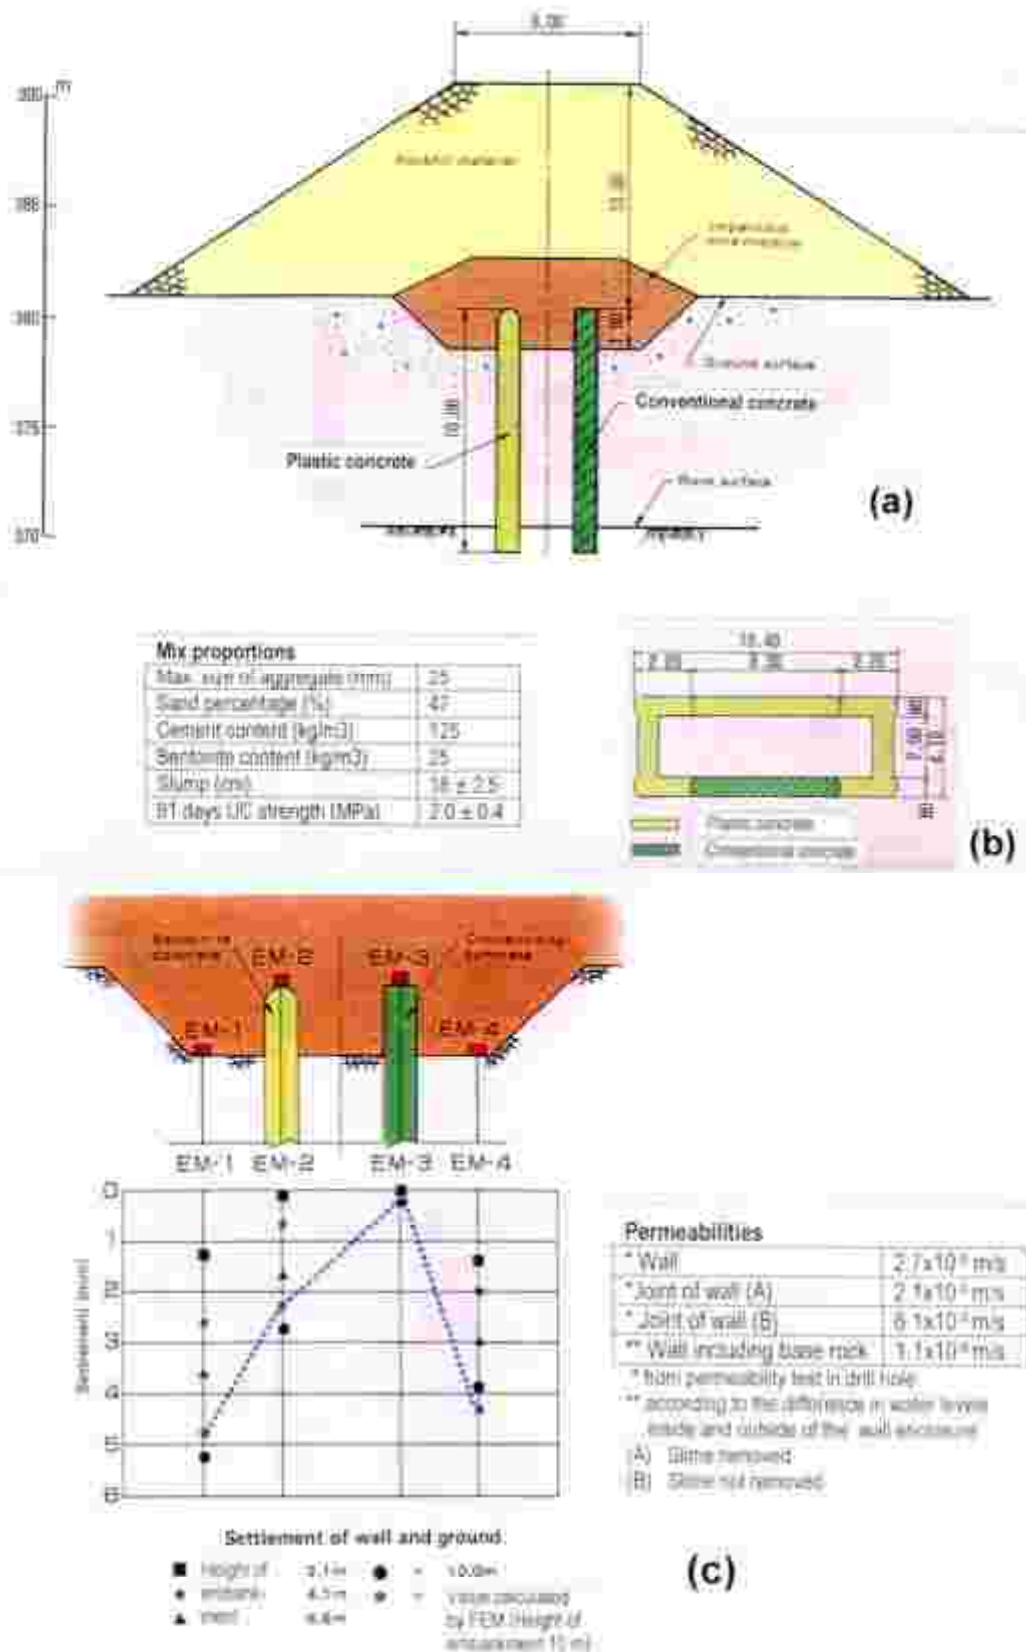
Field test for feasibility of plastic concrete diaphragm wall: (a) Section through embankment fill with walls of two different materials, (b) cutoff walls in the shape of rectangular enclosure and mix proportions for plastic concrete, (c) test results, settlements and permeabilities.
